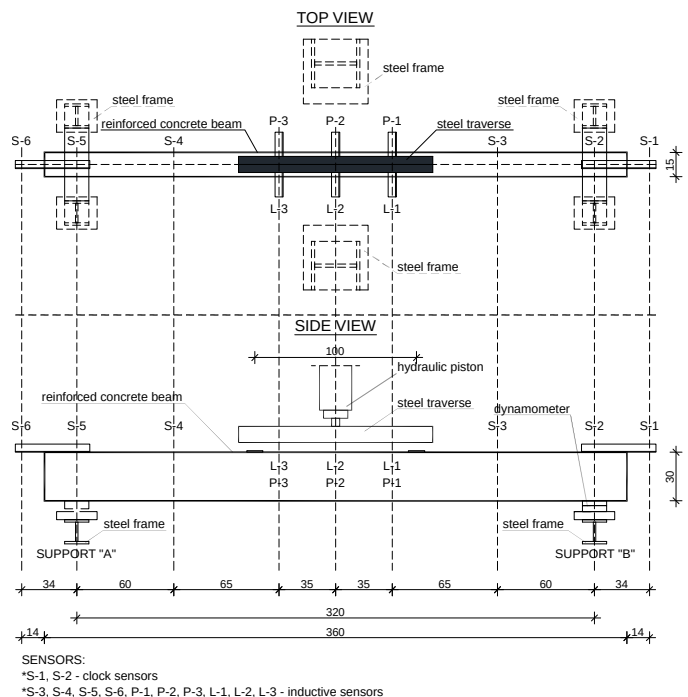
The test stand for testing RC beams (dimensions in cm)
